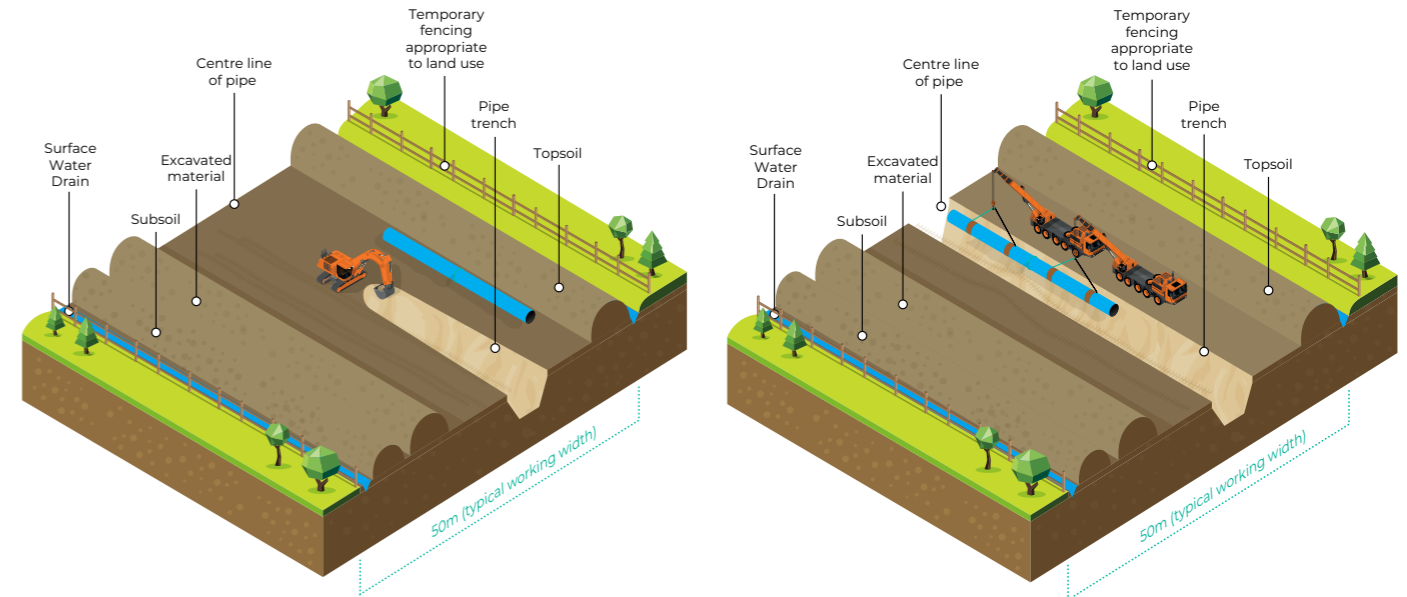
THE CONSTRUCTION PROCESS TRENCH EXCAVATION AND PIPE INSTALLATION
